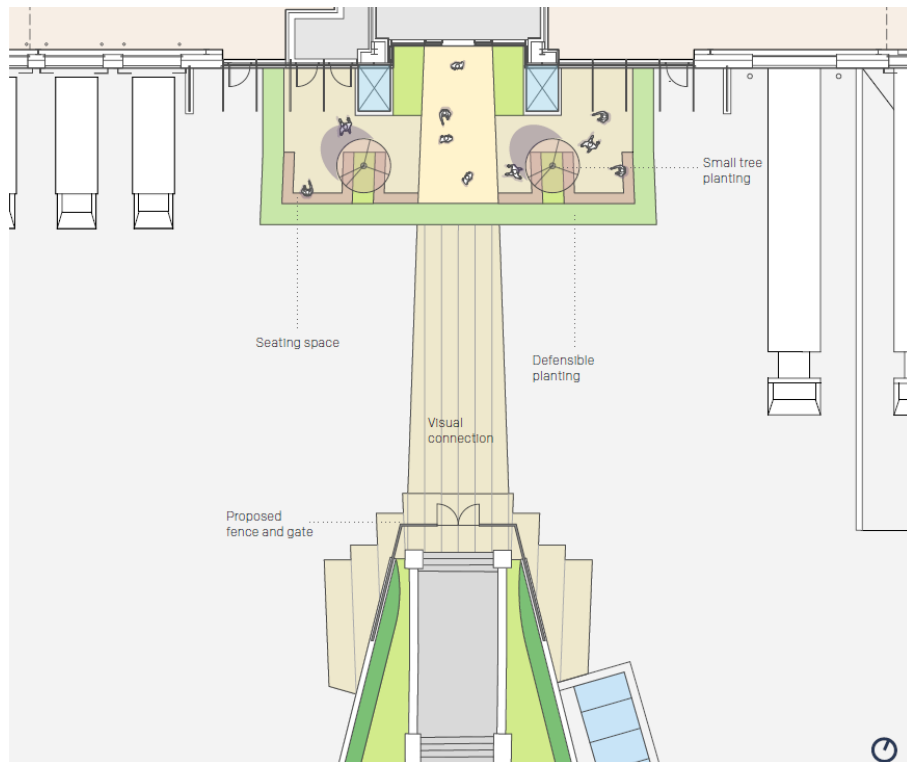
Extract of the proposed landscaping and entrance arrangement
